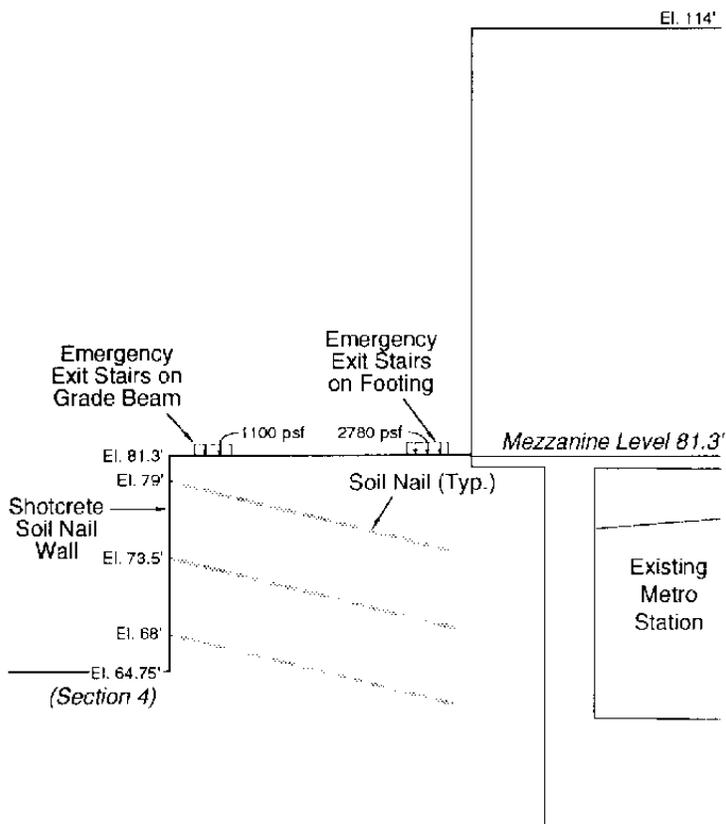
Soil Nail Wall Section 4 at Station Entrance
